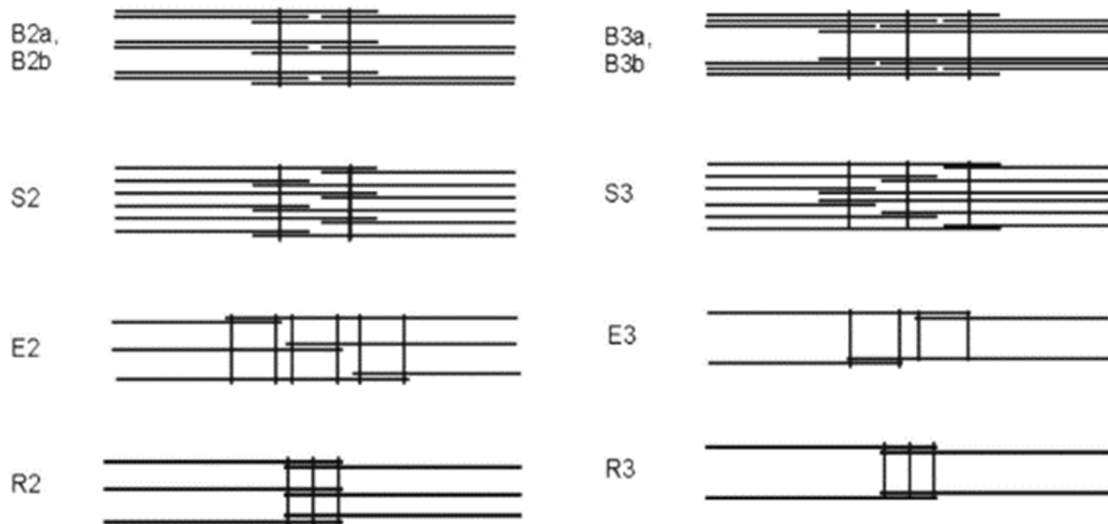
Reinforcement layout of the specimens tested by Cairns (2013)
